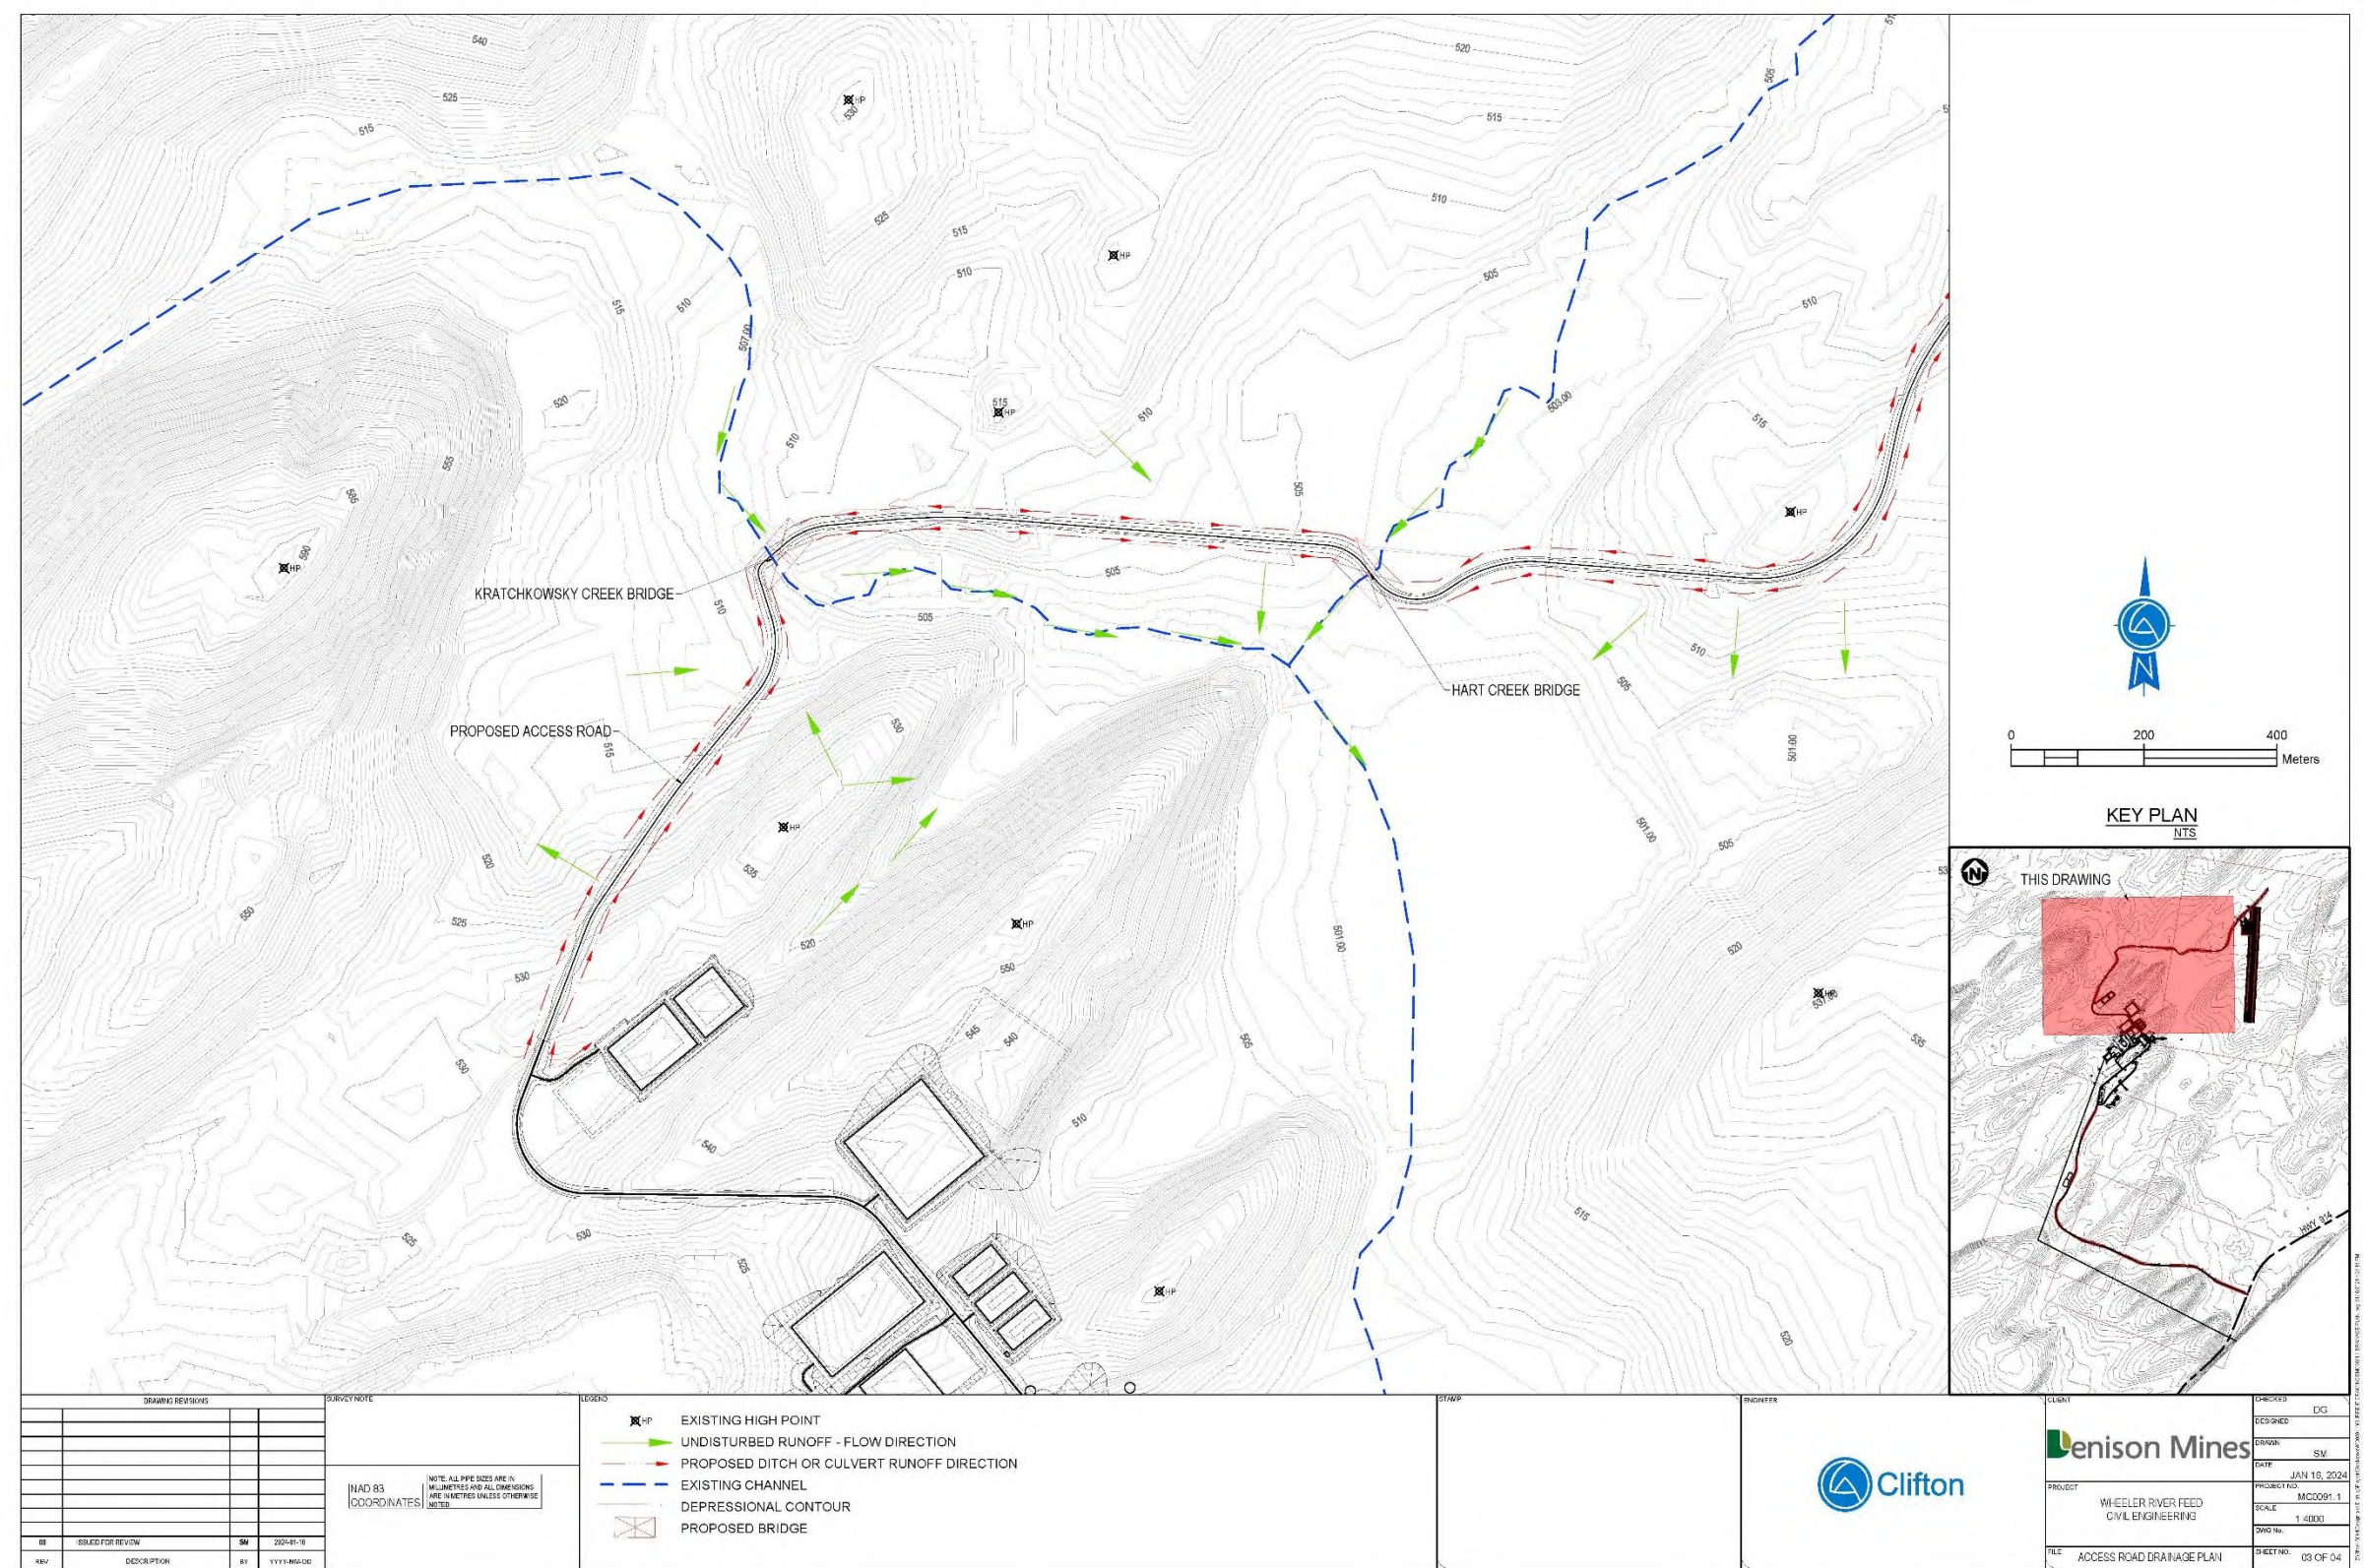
3: Conceptual Site Drainage – Road to Airstrip
